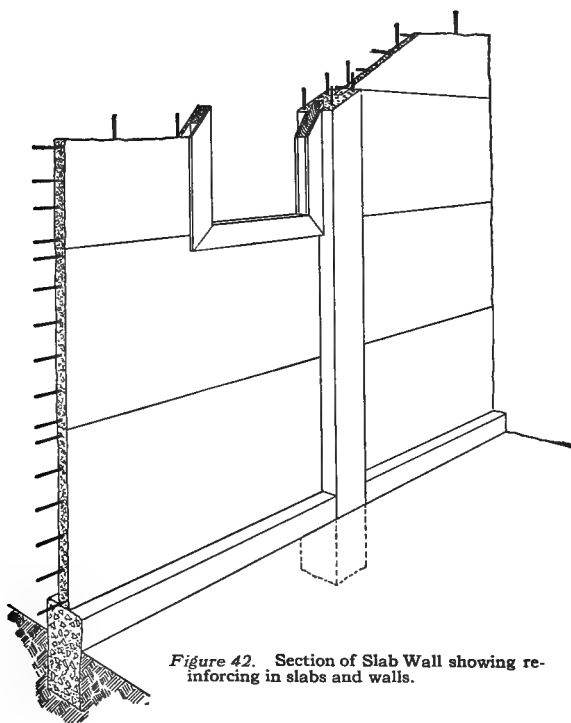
Section of Slab Wall showing reinforcing in slabs and walls.
